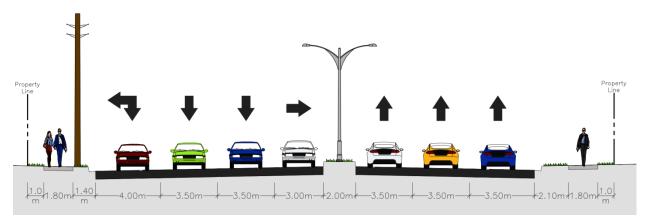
Preferred Design, Highbury Avenue North Cross-Section, North of Hamilton Road
